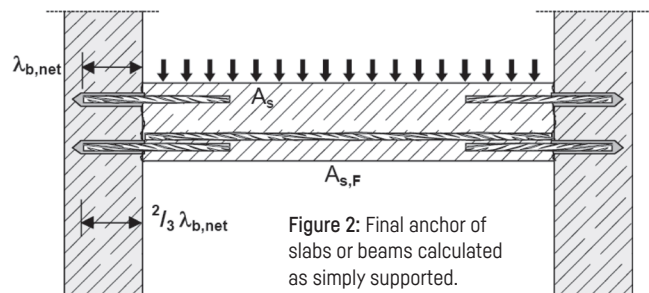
Final anchor of slabs or beams calculated as simply supported.
